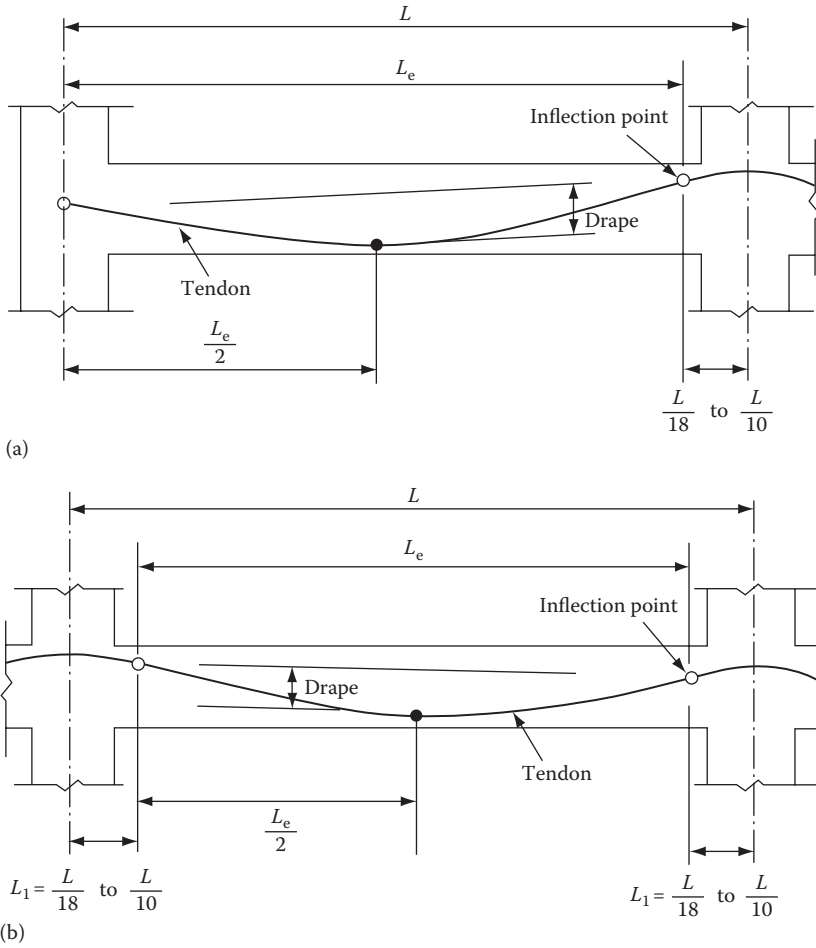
Tendon profile: (a) typical exterior span and (b) typical interior span.
